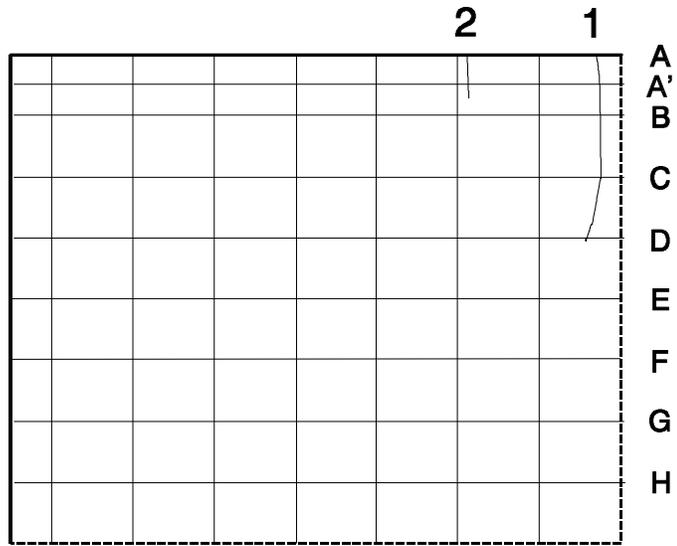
POJ-PU-74-TH cracking patterns on south face of overhang at dead load
